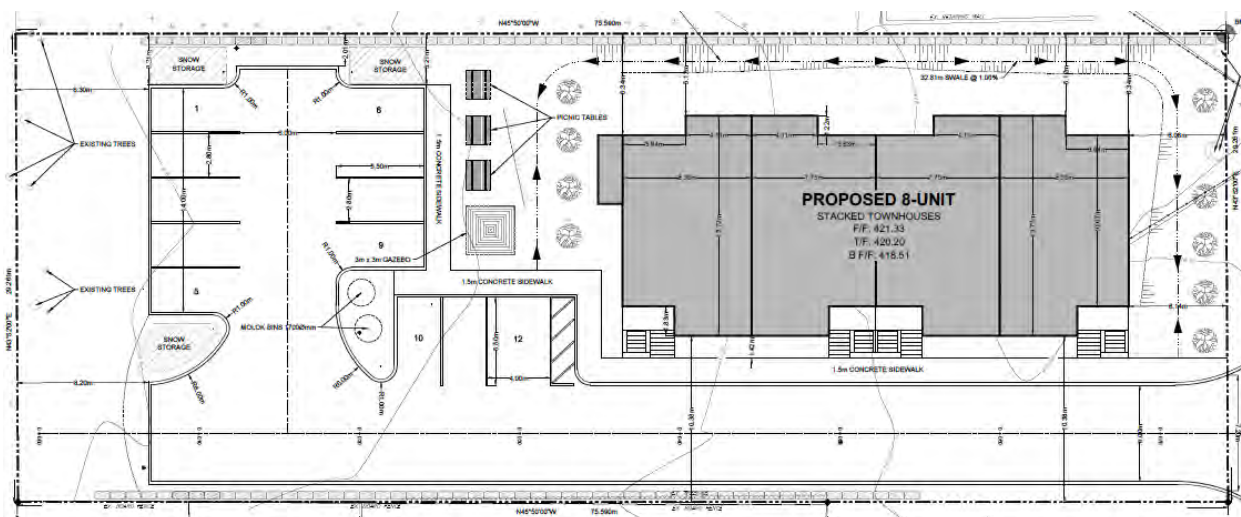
Site plan sketch prepared by Cobide Engineering, March 2023
